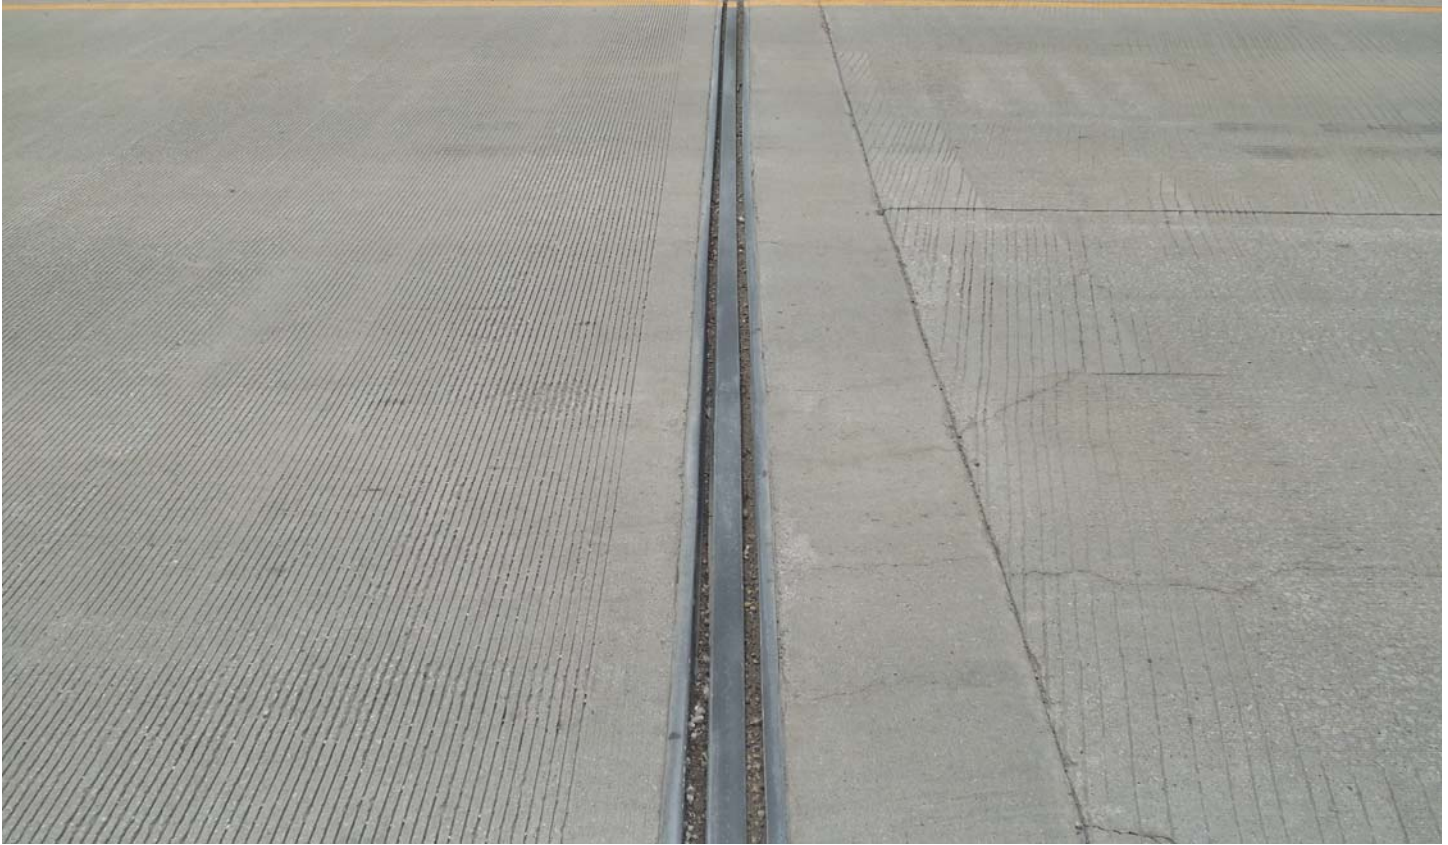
Deck Joint at West Abutment in the Westbound Lane Looking South
